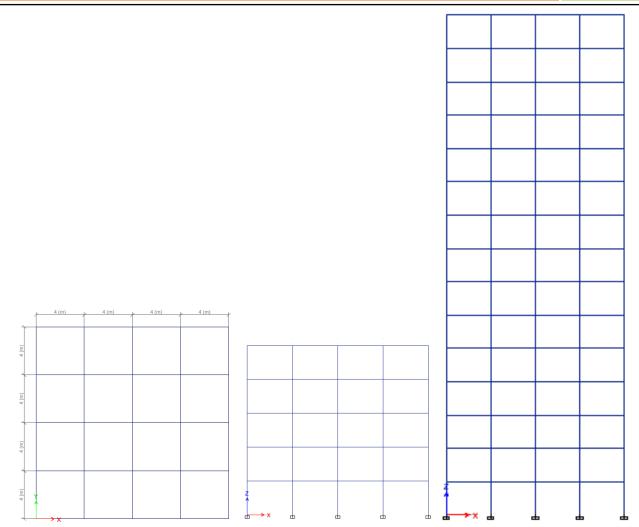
illustrates Plan of buildings(x-y) plane and Elevation(x-z)plane of both five and fifteen storey
